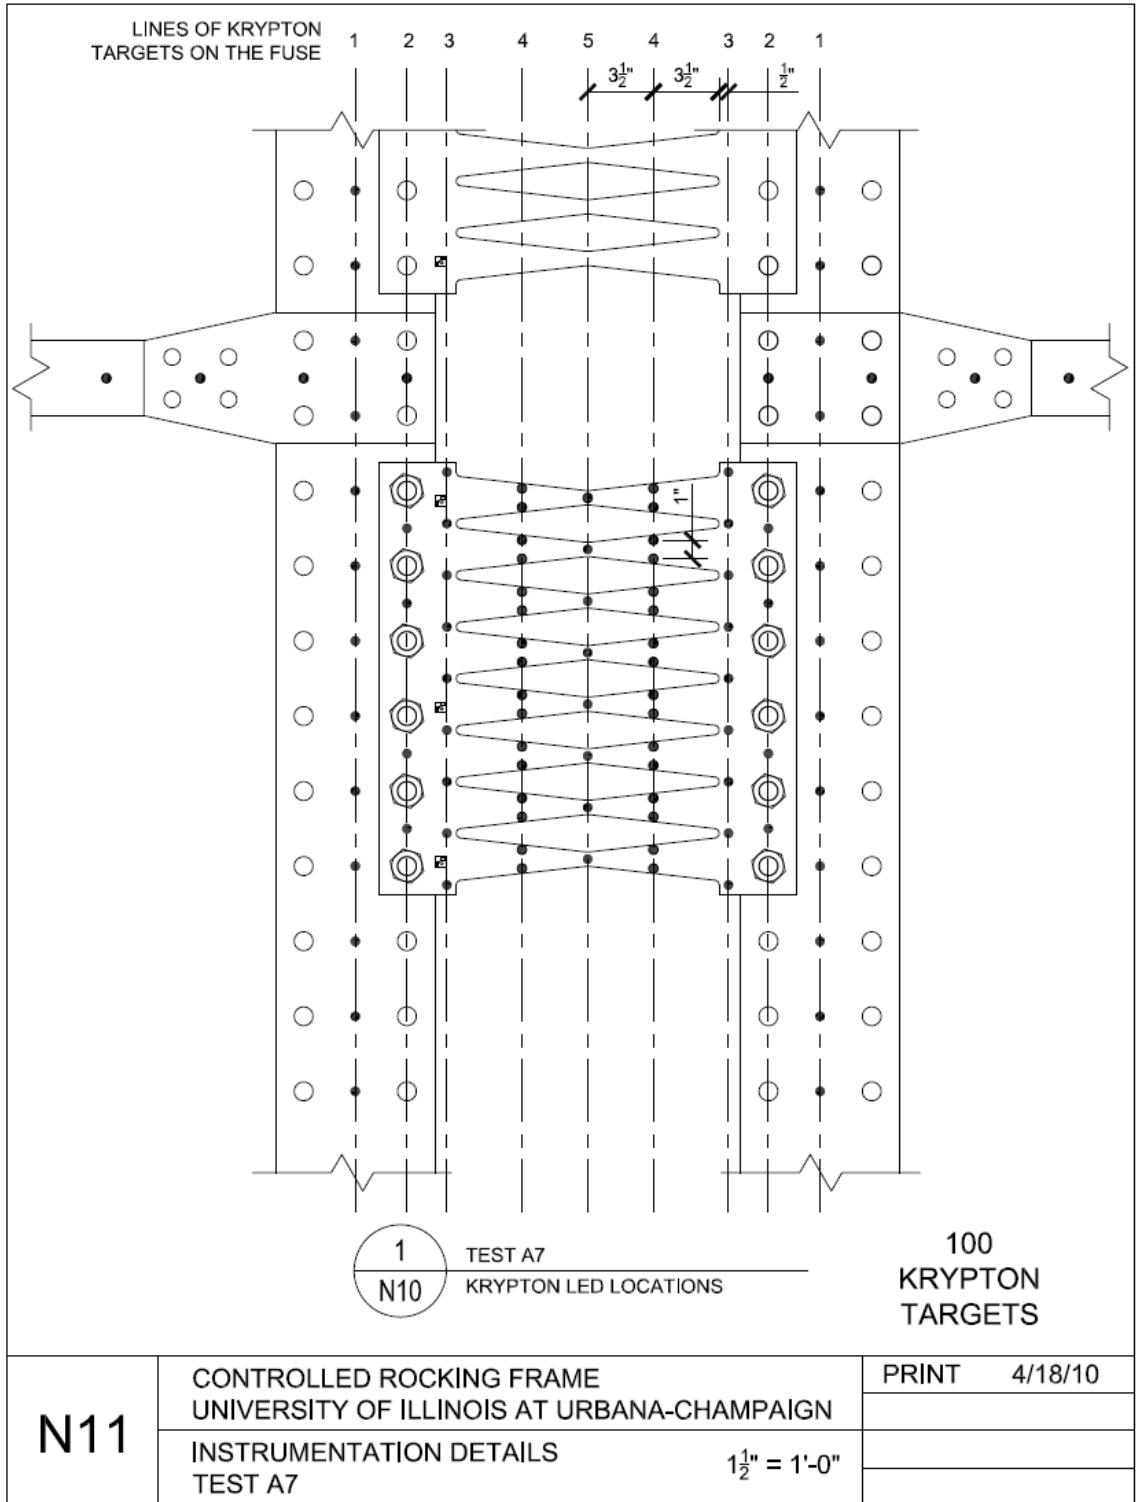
Instrumentation Plan Drawing – Krypton LED’s for Specimen A7
